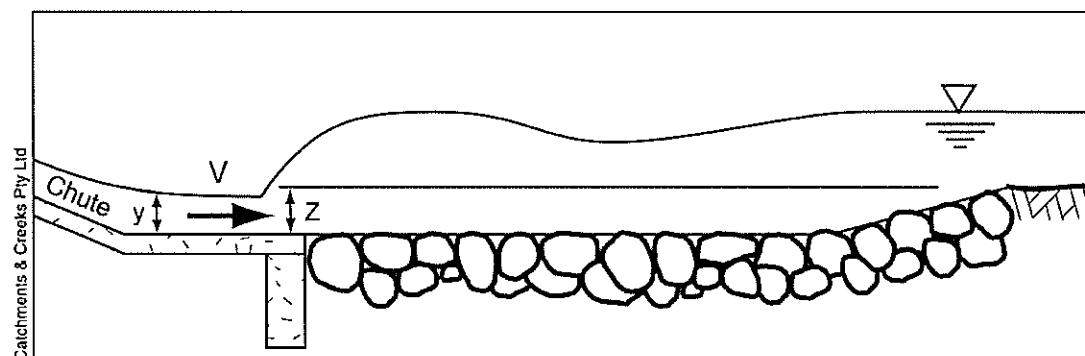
Typical profile of recessed outlet structure for minor *Chutes
